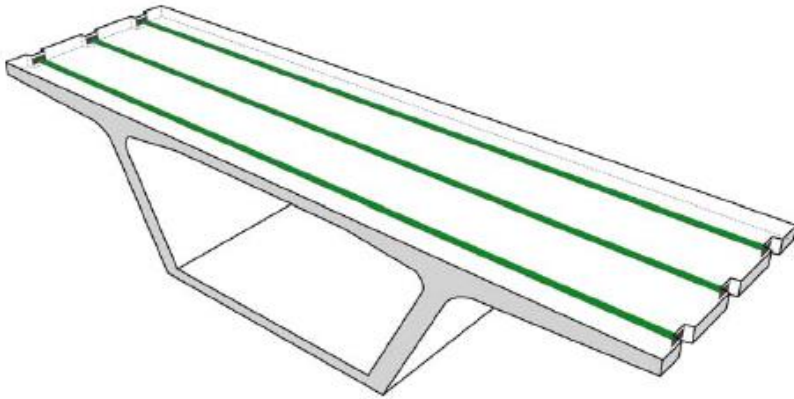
Transverse Post-Tensioning in the Top Slab of Box Girde
